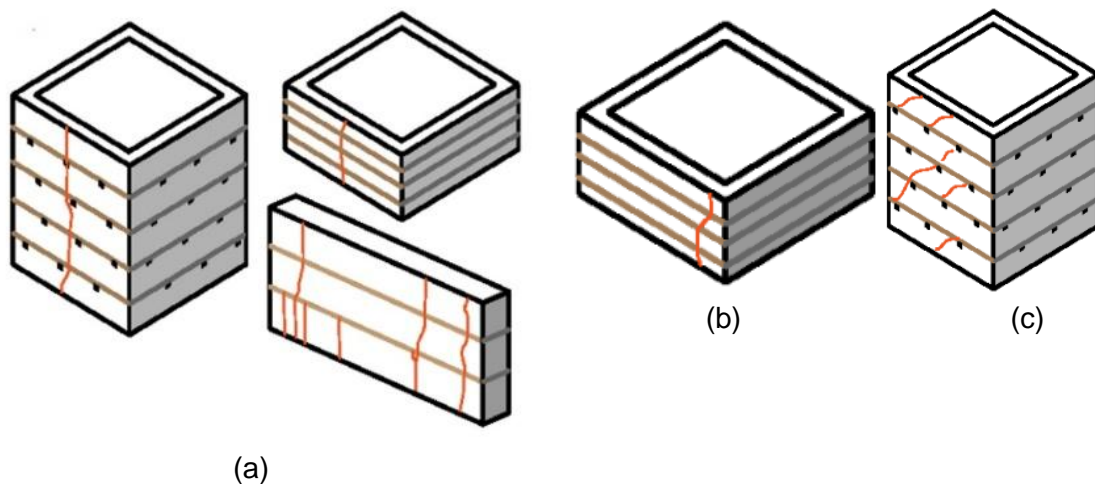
Typical earthquake-damage pattern in rammed earth buildings: (a) vertical cracking, starts at the base and sometimes runs throughout the height; (b) Vertical cracking at corners; (c) In-plane shear cracking (Ziegert, 2010)
